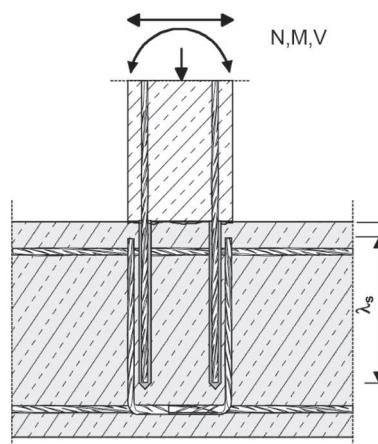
Bond superimposed to a foundation of a column or a wall where the rebars are subjected to tensile force.
